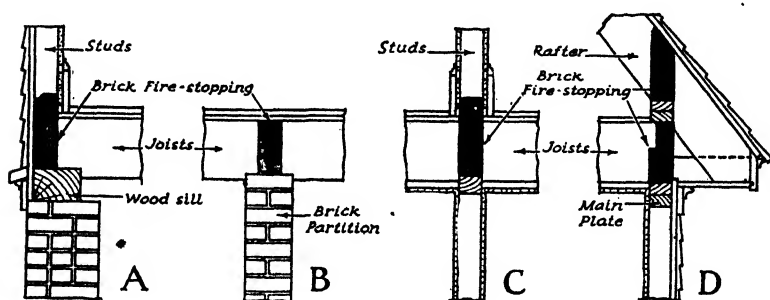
Typical method of using brick for fire stopping in frame construction. (A) at sill line; (B) between joists resting on brick partition; (C) between joists and studs in a typical interior partition; (D) at eaves.
